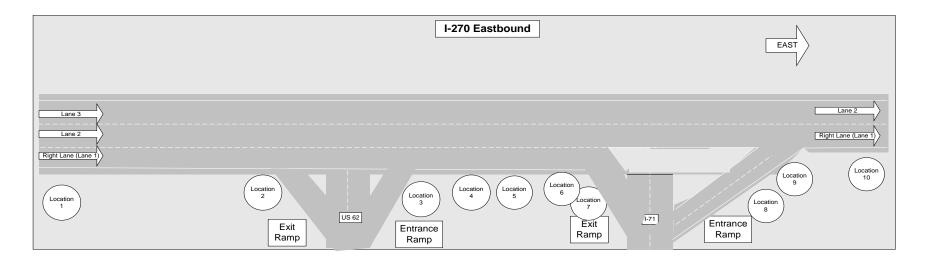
Drawing of Trailer Locations on I-270 Eastbound after Construction
